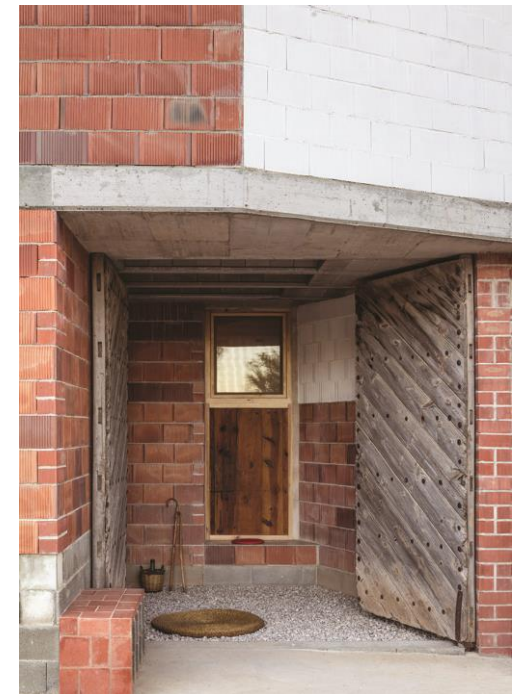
David Sebastian, Casa en tres primaveres. Reuse of the reclaimed old door as a window within the masonry new surfaces of the house. Credits: Adrià Goula, Jordi Salinas.
